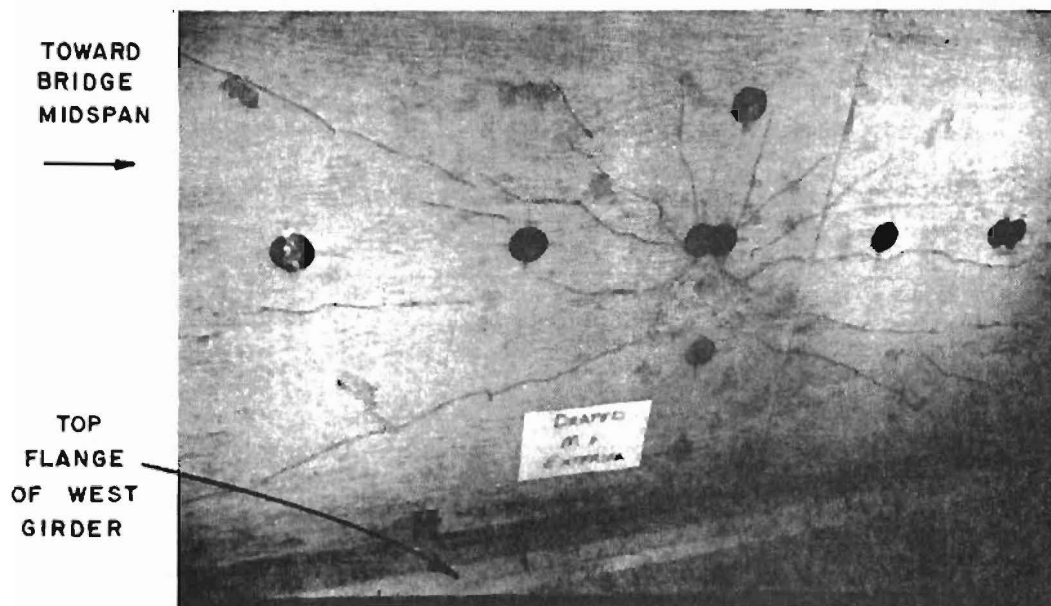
Typical cracking in top of bridge slab, positive moment test, straight strand exterior location
